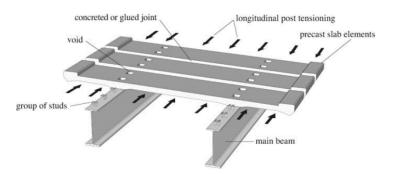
Slab construction by precasting principle (Lebet & Hirt, 2013)
